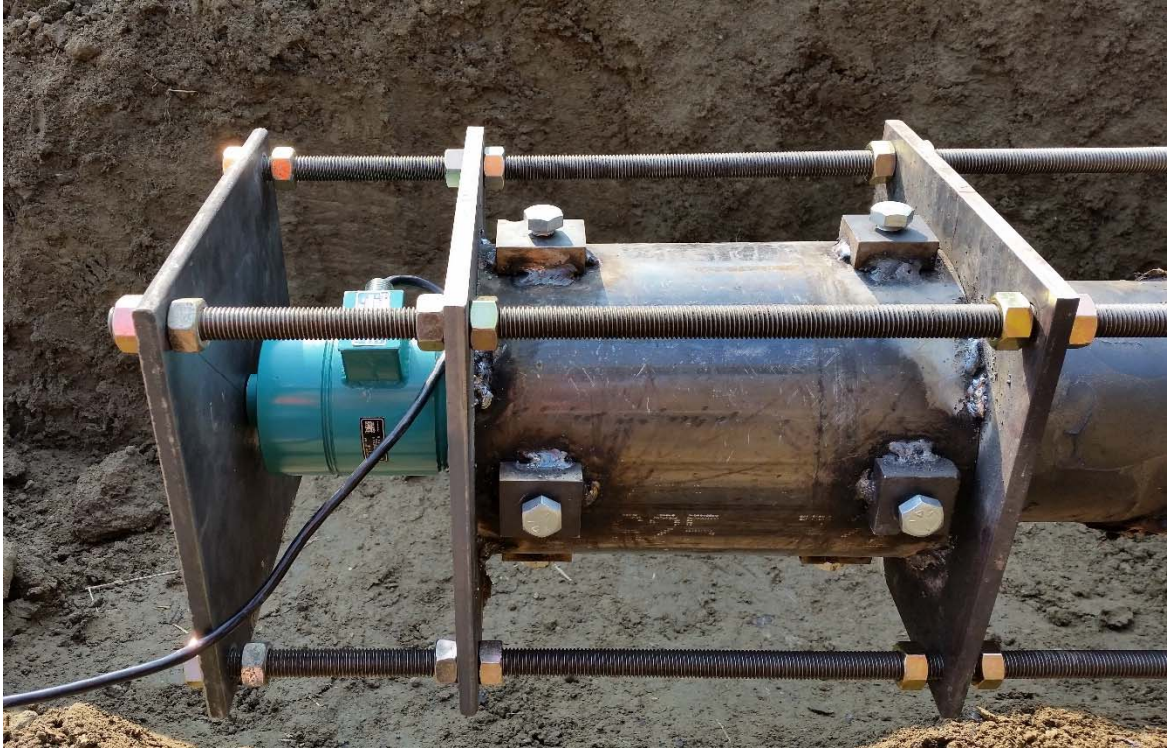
Fabricated Strike Plate and Pipe Attachment.
